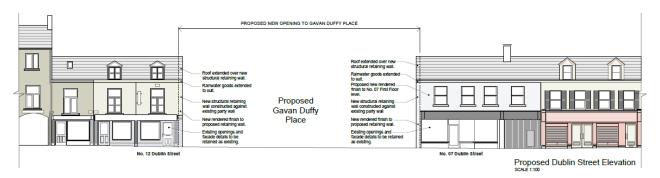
Excerpt from Planning Drawing A-20-001 showing the new opening on Dublin Street
